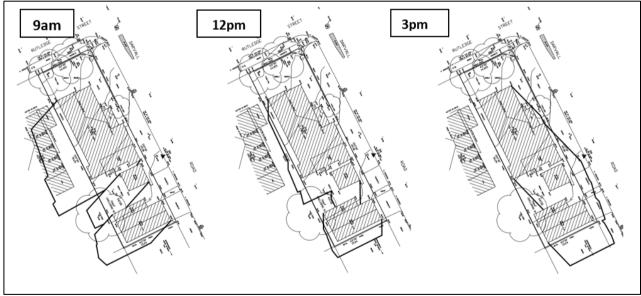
Existing shadow diagram showing existing dwelling does not overshadow the neighbouring dwelling between 12pm and 3pm
